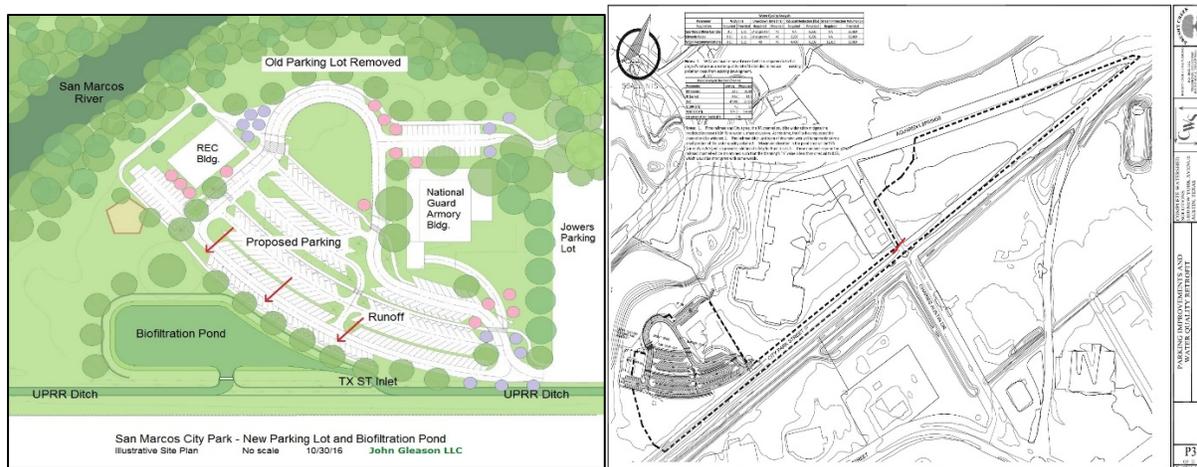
Design Concept Plan for UPRR channel Pond 2 at San Marcos Plaza.
